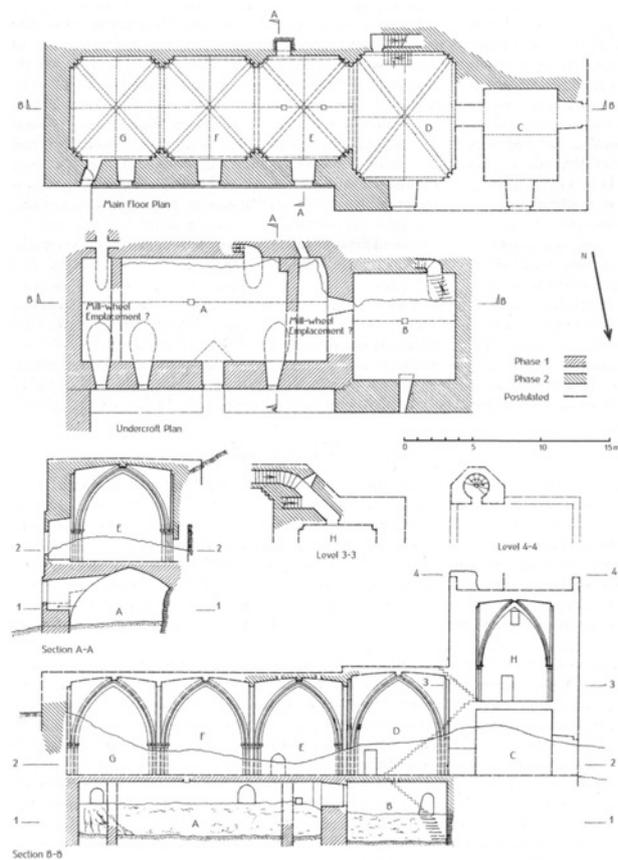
Pringle's plan of the mill building (after Pringle, 1986, pp. 58–59).
